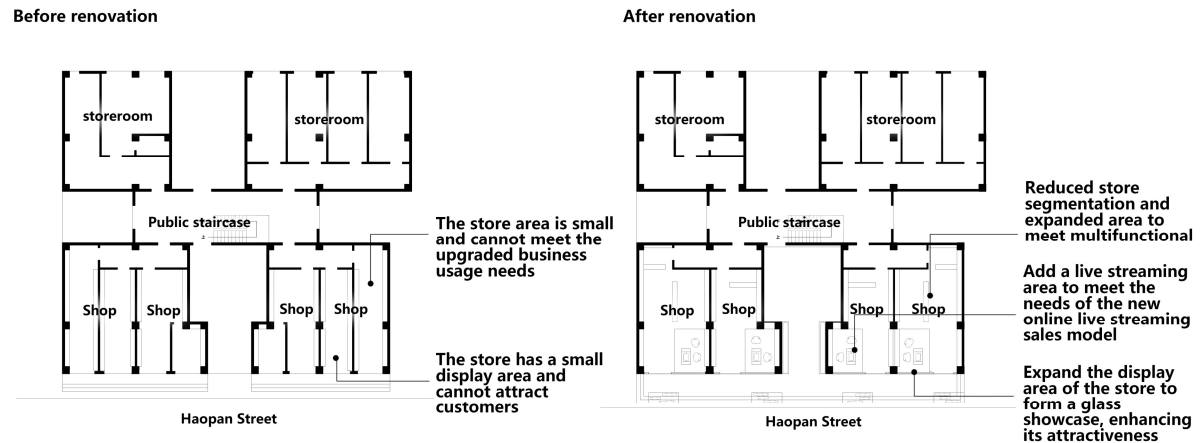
Multi-Story Residential Building Pre - and Post Renovation Plan
